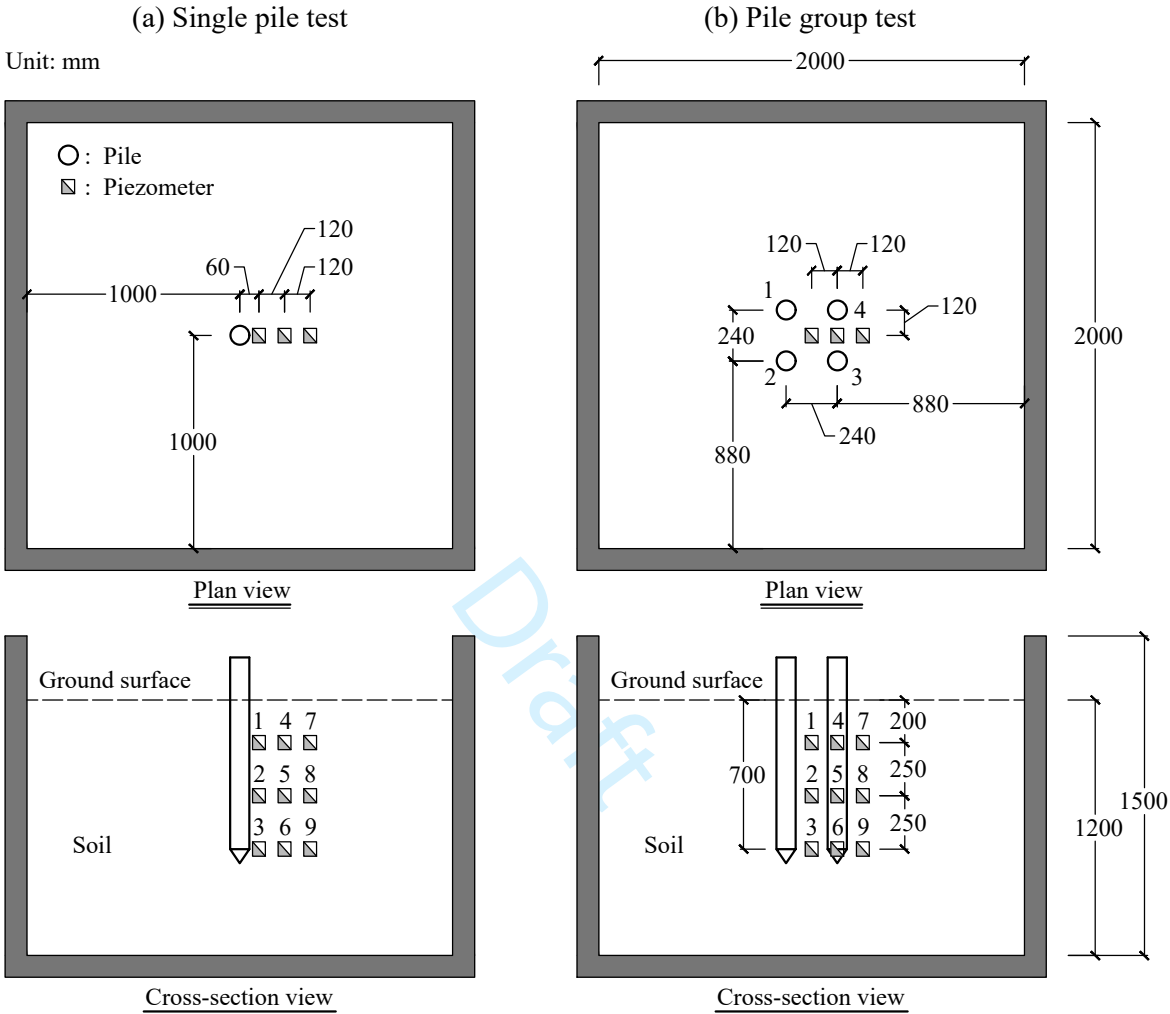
Physical model of piles embedded in clayey soil: (a) single pile test; (b) Pile group test
